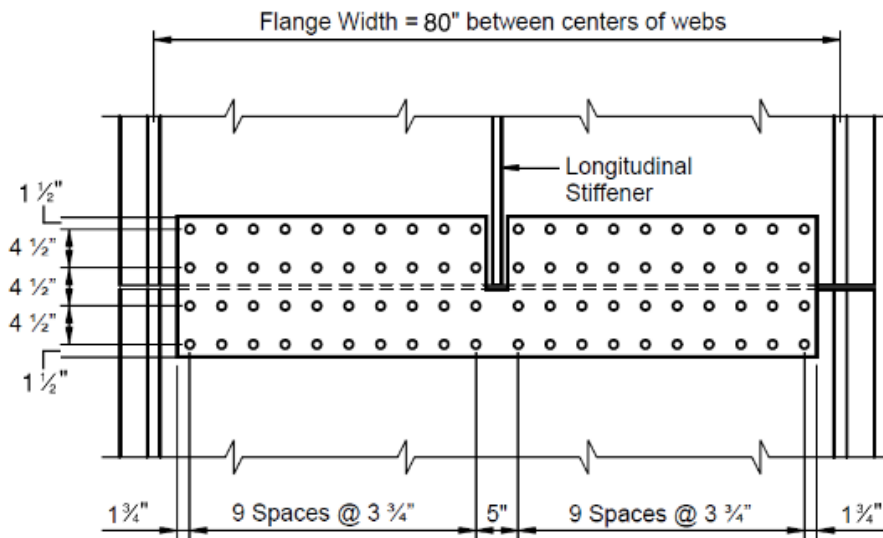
Bolt Pattern for the Bottom Flange Field Splice, shown inside the tub girder looking down at the bottom flange
